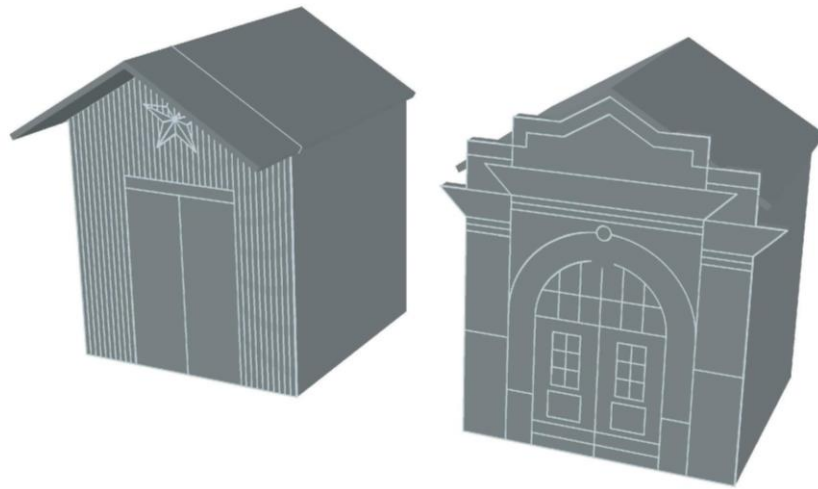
(left to right) 3D CAD Façade Drawings of Ramsdale Barn and Mechanicsville Schoolhouse
